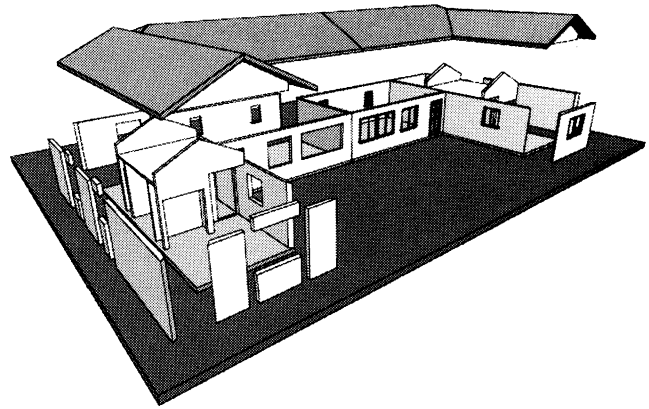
1 story prototype as built: West unit: foam core panels. East Unit: closed wood stud panels with windows and finishes installed at factory. Overall: parallel chord truss roof; site built interior partitions; cmu party wall; concrete slab.
